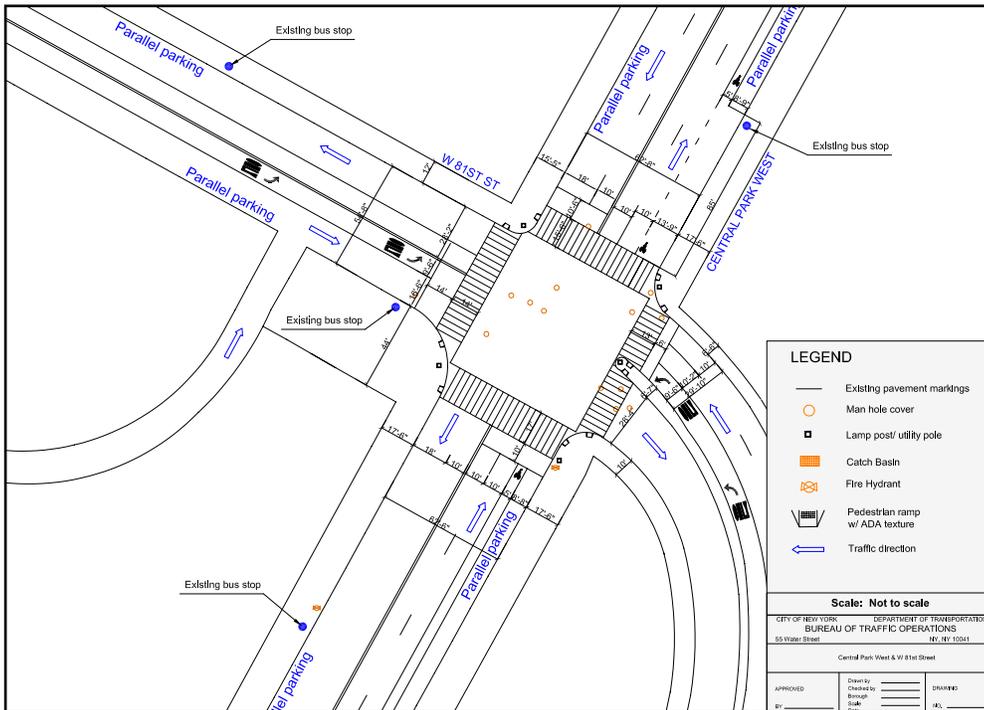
Existing Condition - Central Park West & West 81st Street
